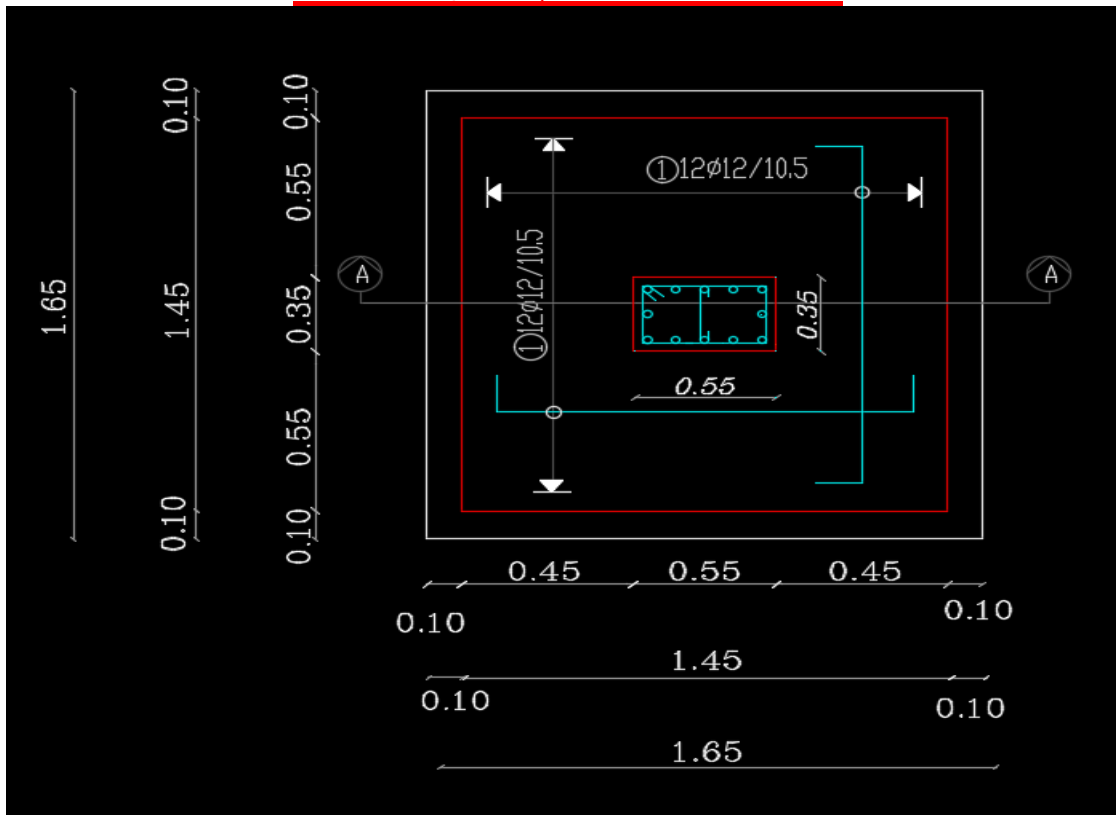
15): isolated footing (F1(1.45*1.45))) detailing.
